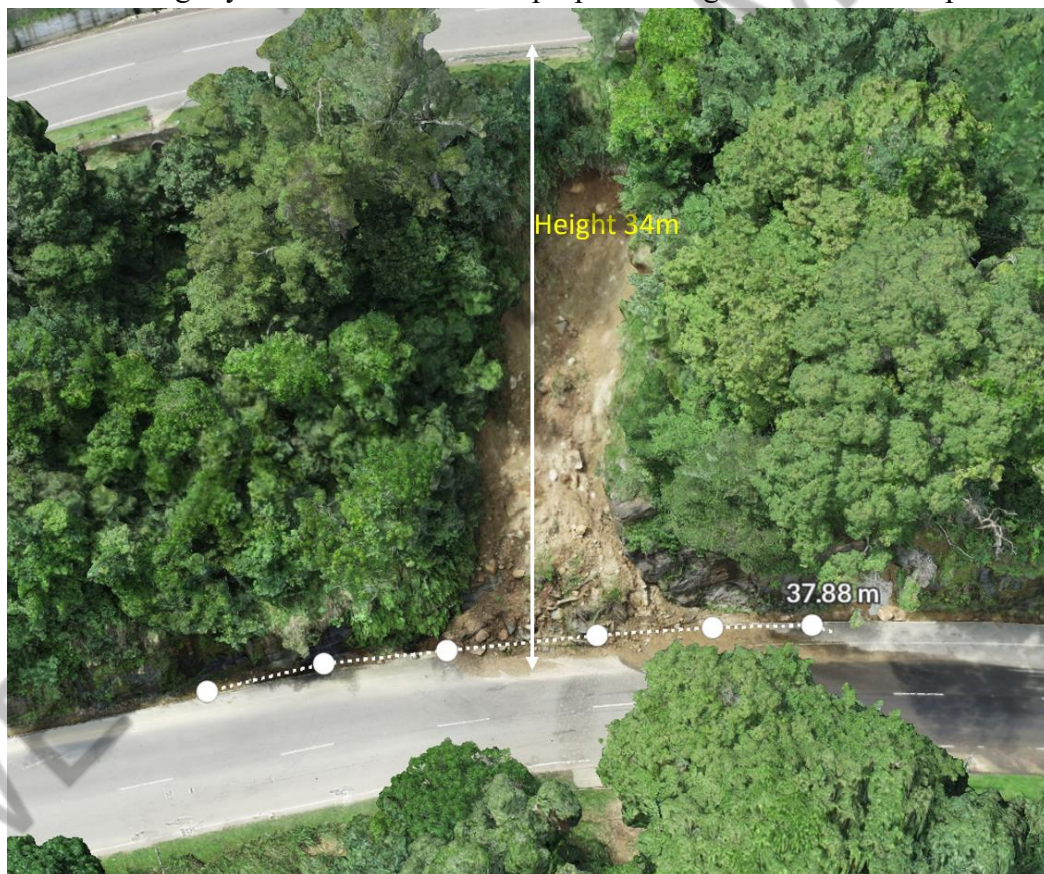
Extent of slope to be rectified between culvert number 58/4 to 58/5 (Aerial View)
